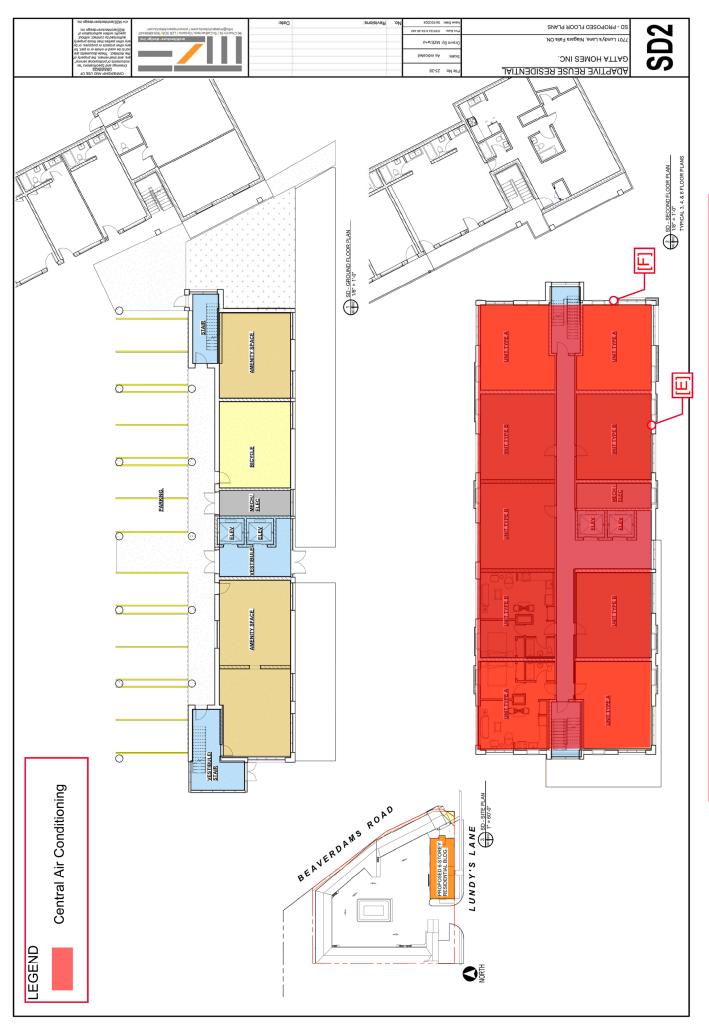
Proposed Site Plan Showing Ventilation Requirements (6-Storey Building)
